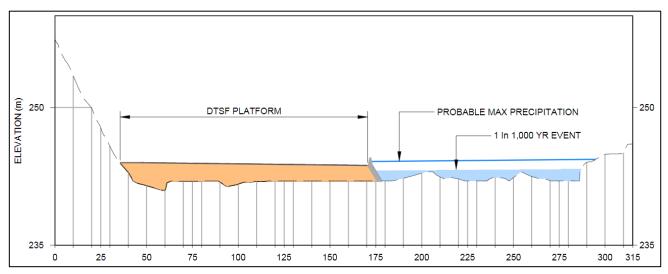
Typical Section through the DTSF Showing Elevations Relative to a 1 in 1,000-year Flood Event
